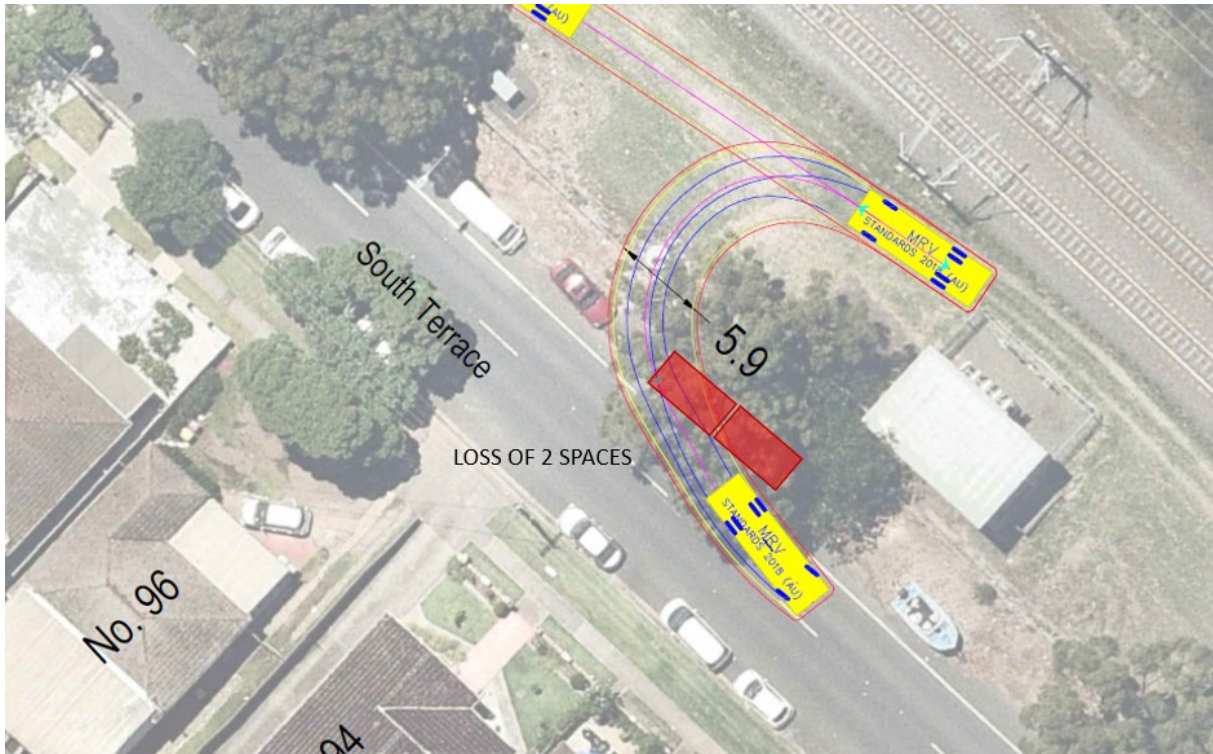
PB10 – M24 17.363D Parking Space Loss
